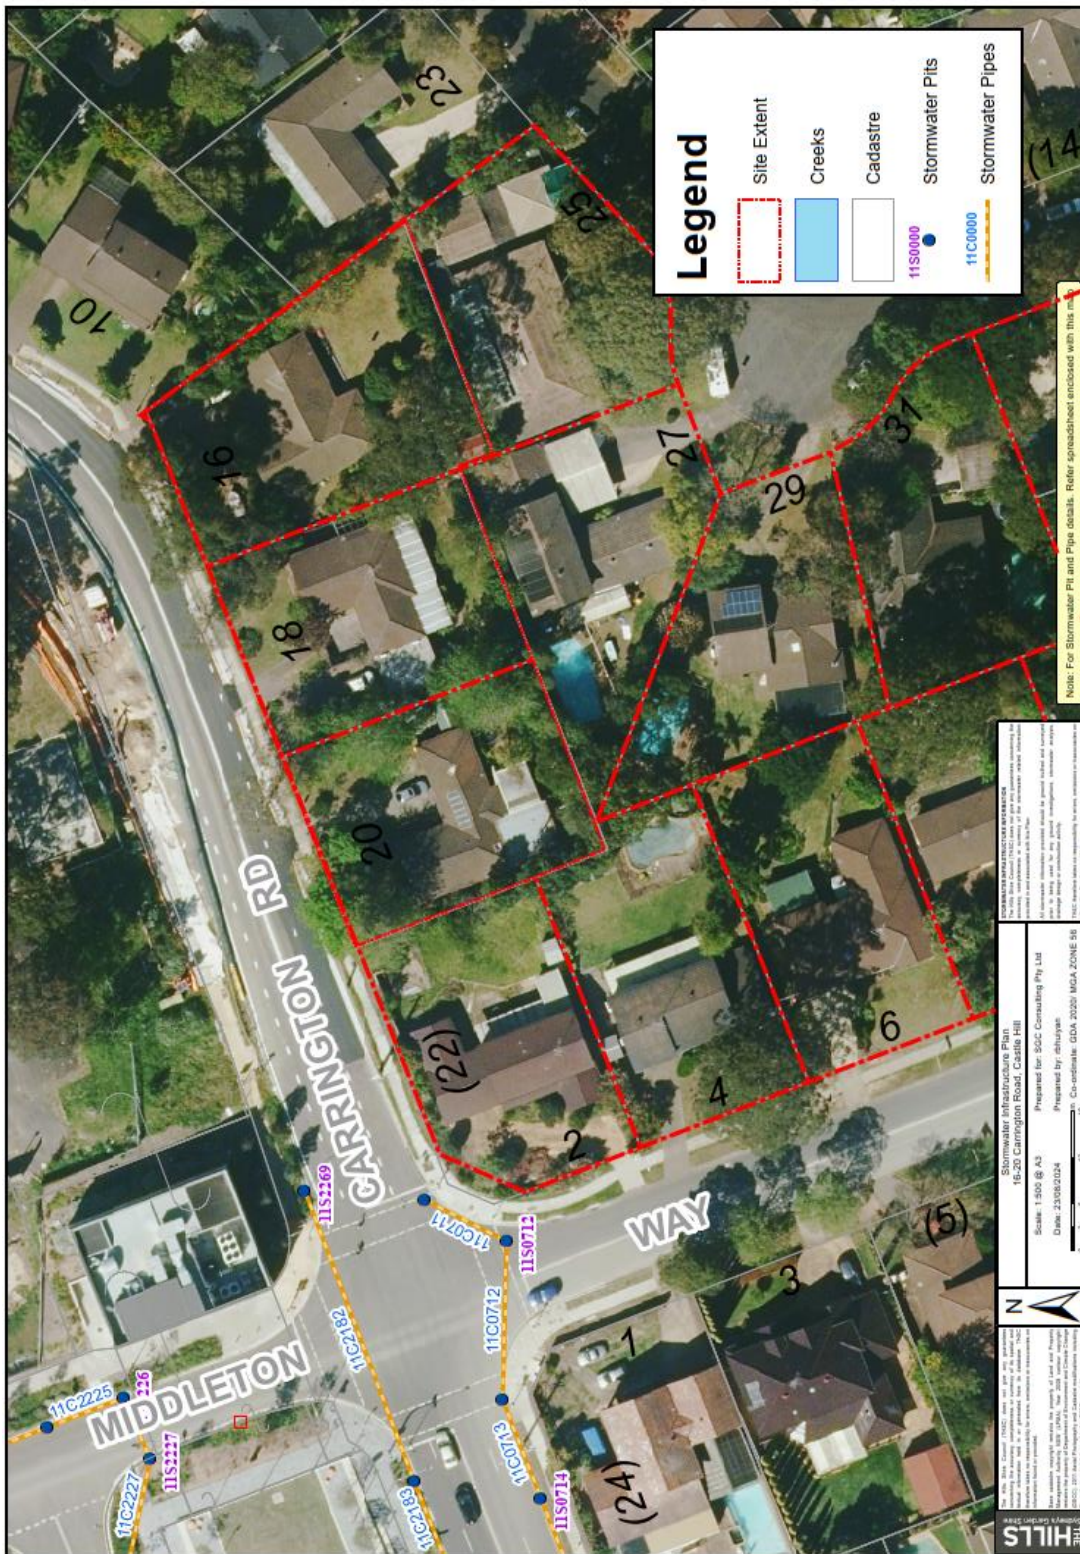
Hills Shire Council – Stormwater Infrastructure Plan 4
